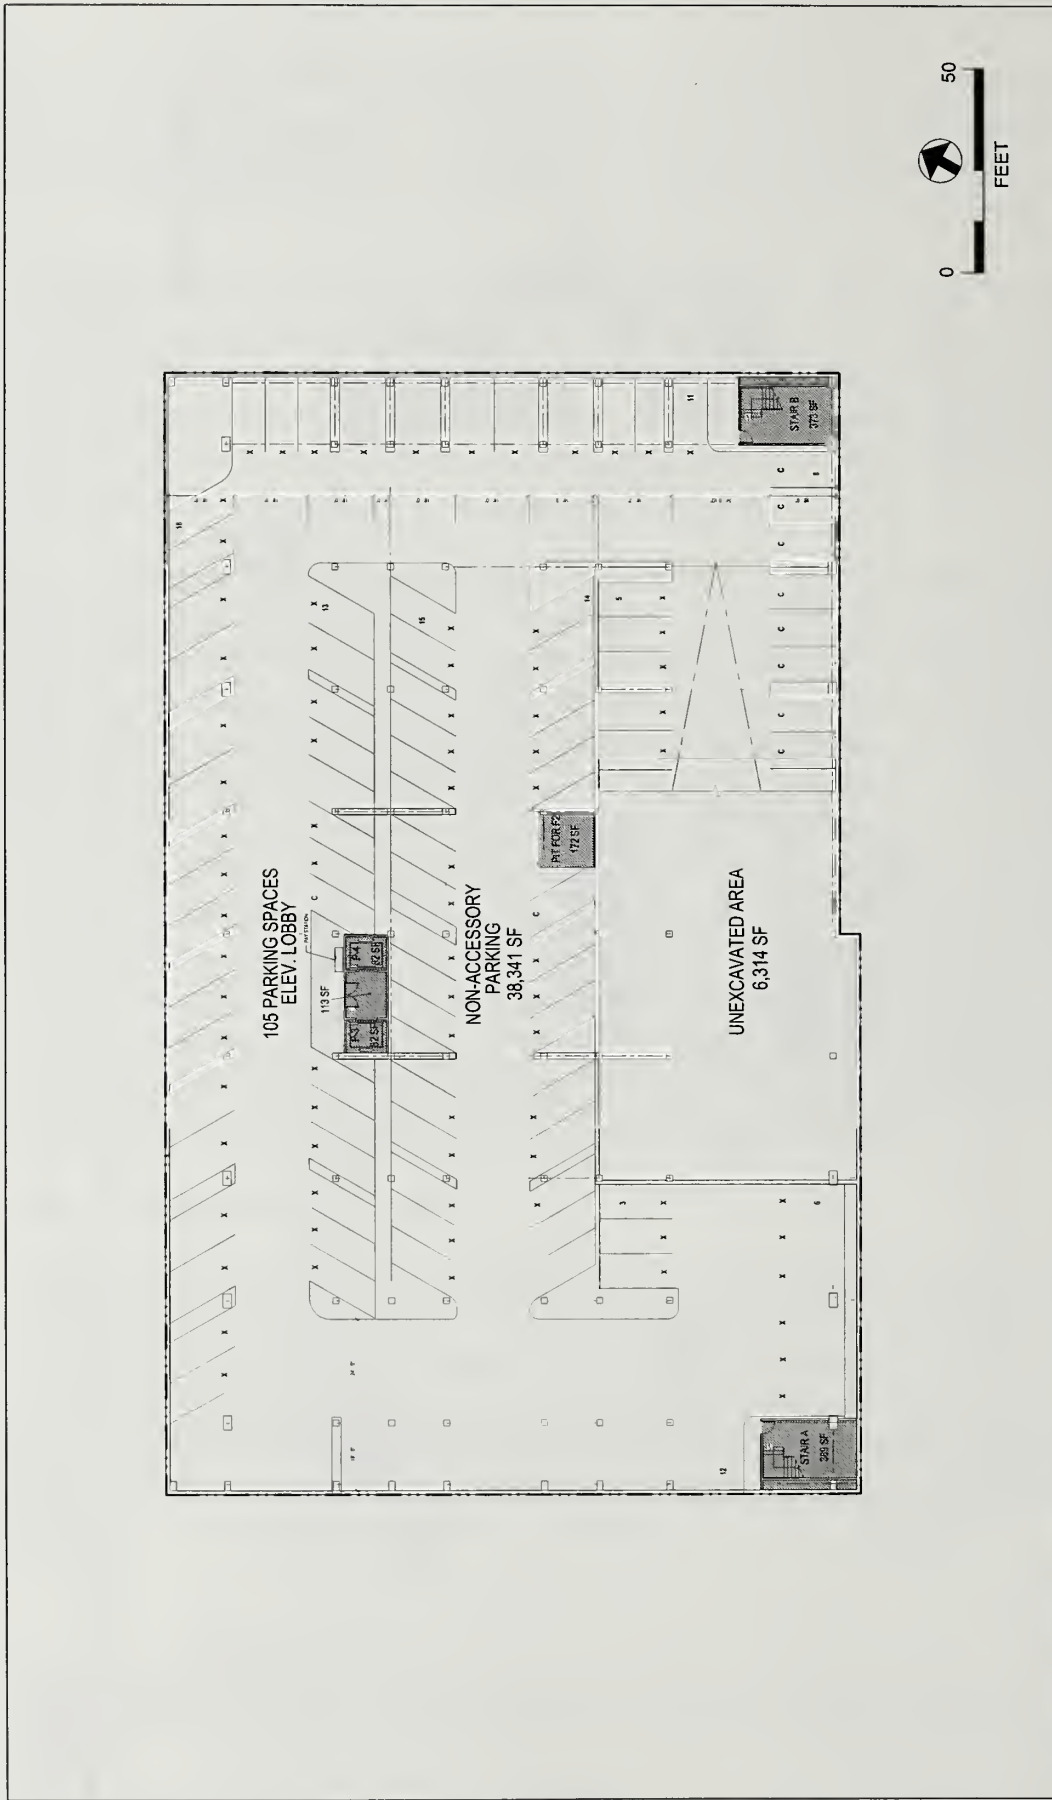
PROPOSED SECOND BASEMENT FLOOR (B2) PLAN
